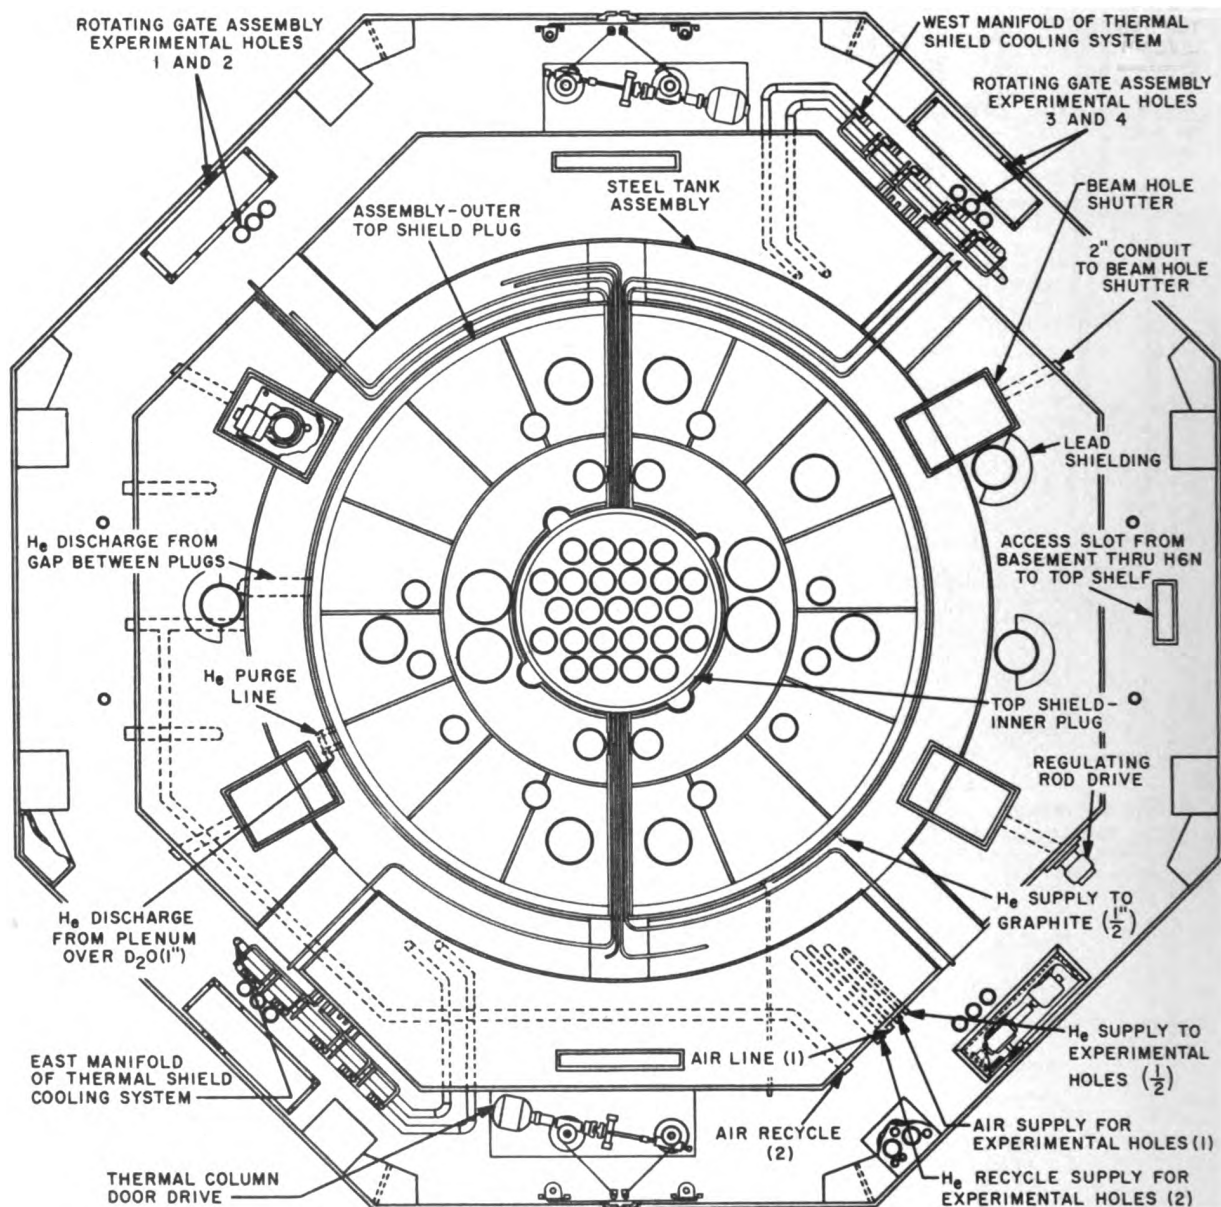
Horizontal section with 1-in. top plate removed.
